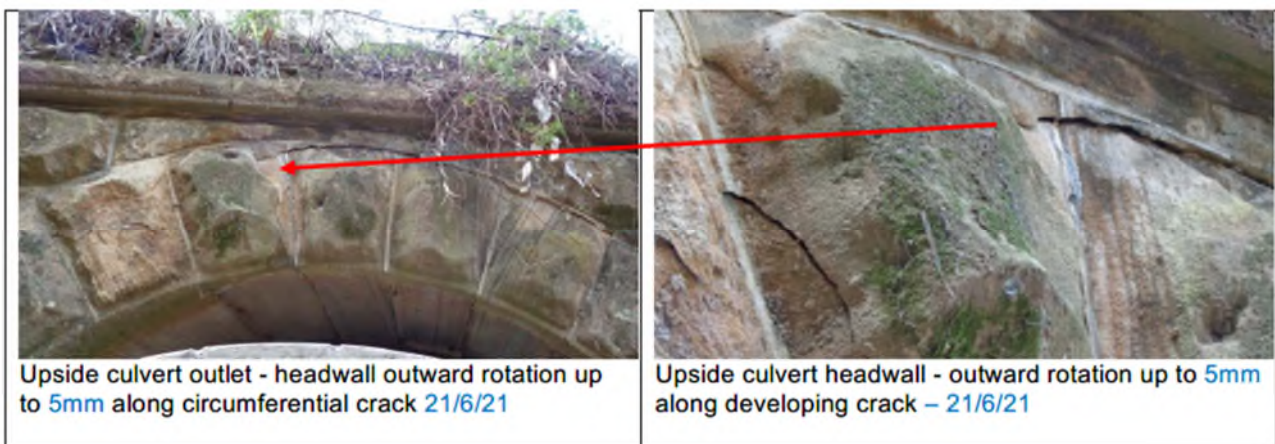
Cracking at culvert 88.980 km (source: LW W2 PMLL Detailed Monitoring Report 29, Appendix F).
